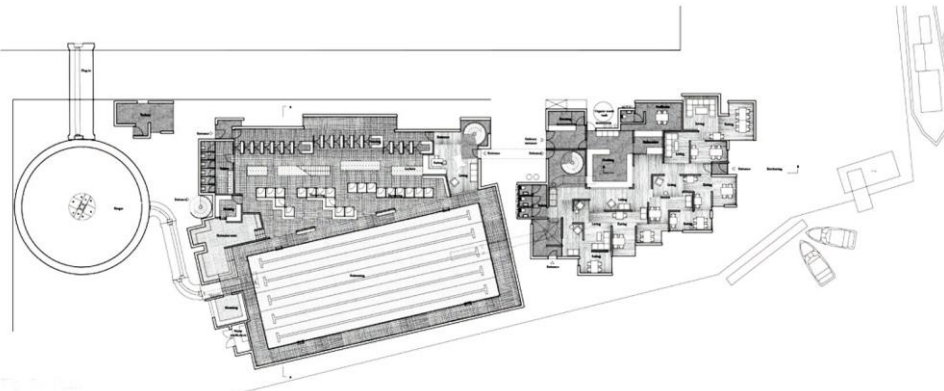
Arrival between the biogas power plant and the bathhouse facilities
